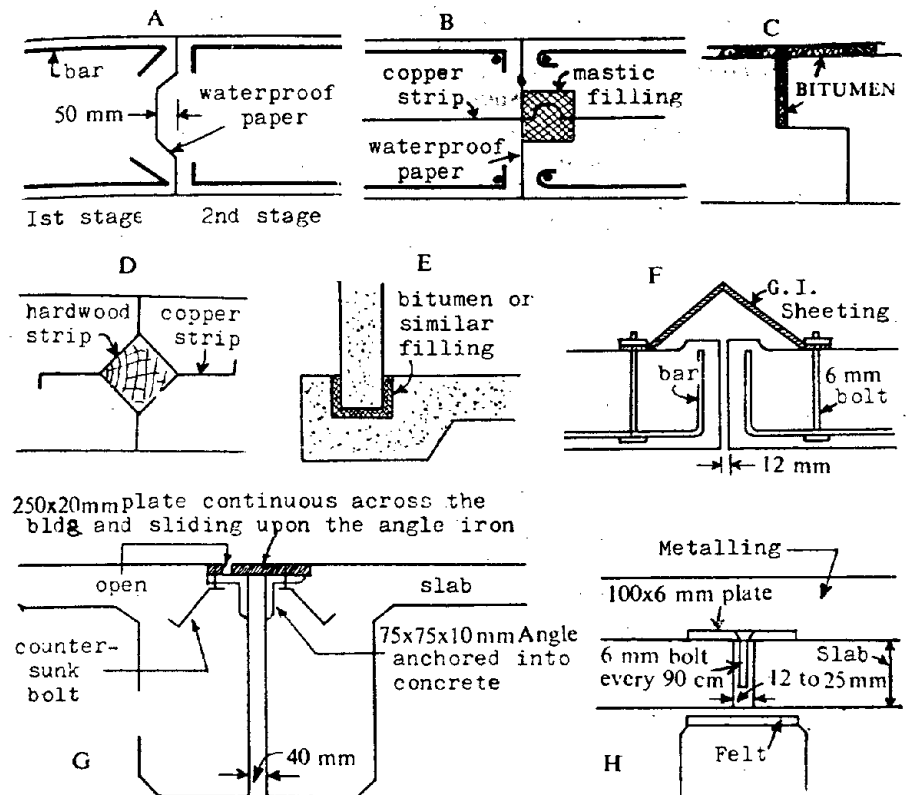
Fig. A : Vertical joints in walls. Where large allowance is desirable for expansion and shrinkage, a space of 6 mm can be left in-between. Where dealing with water leakage, a copper or stainless steel strip, 1.5 mm thick metal can be put in.
